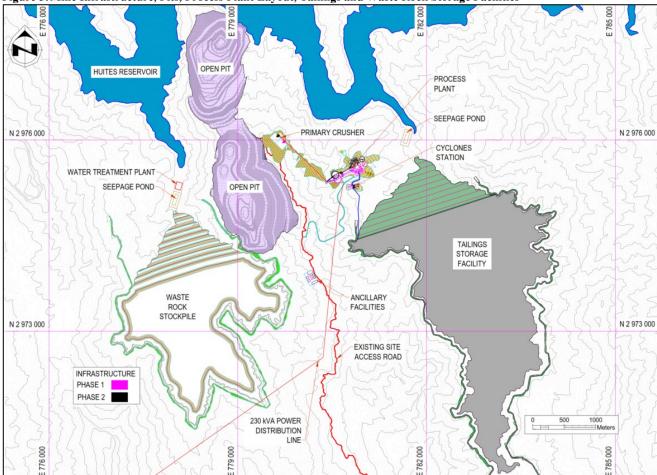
Mine Infrastructure, Pits, Process Plant Layout, Tailings and Waste Rock Storage Facilities
